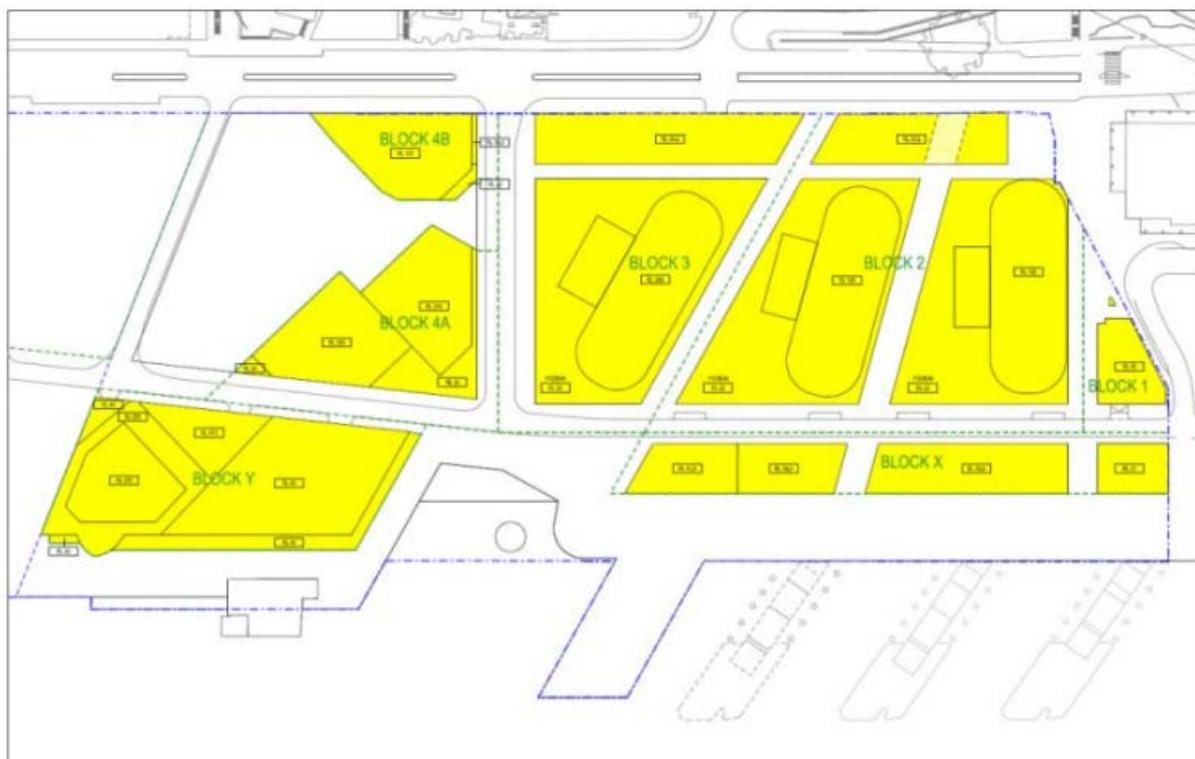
Barangaroo Concept Plan (Source: MP06_0162, MOD 8, Planning Assessment Commission determination report)
